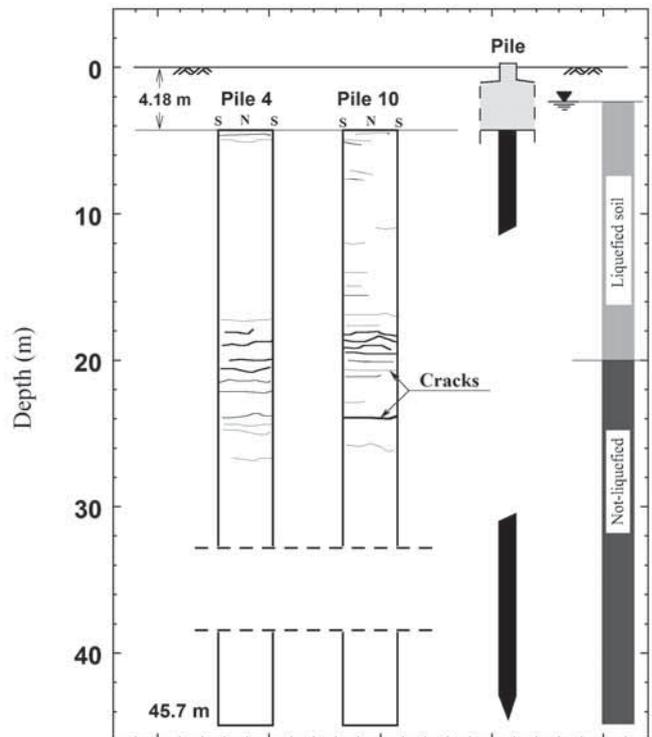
Typical damage to piles observed in the 1995 Kobe earthquake (Uozakihama bridge pier P211)
